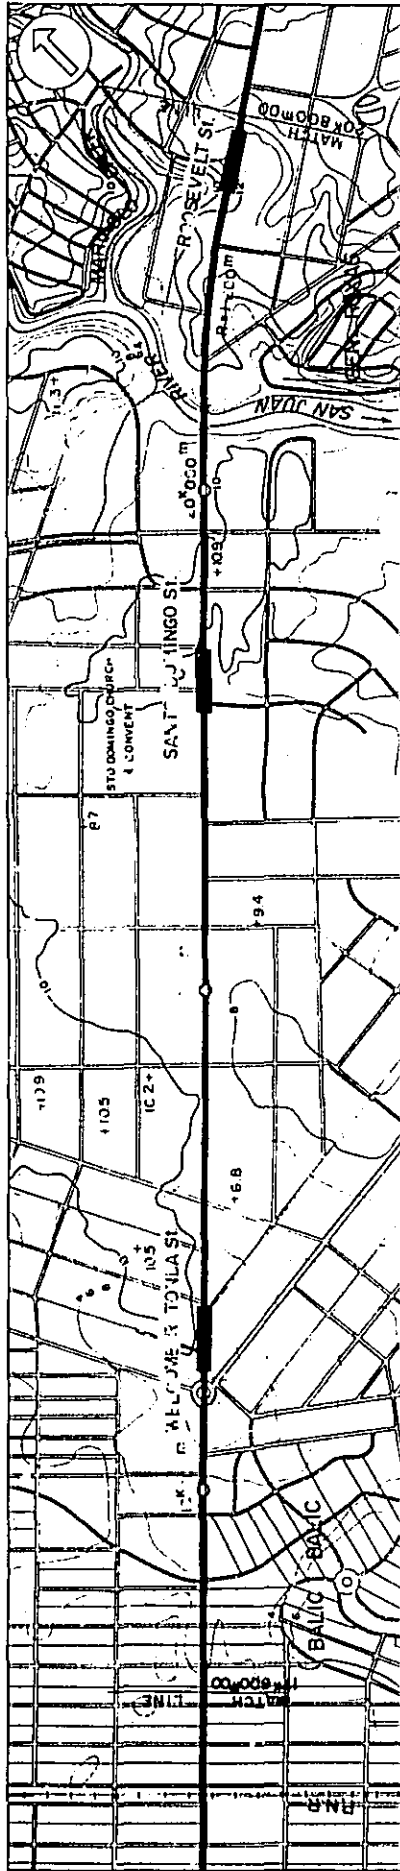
Plan and Profile of Recommended Alternative (5)
